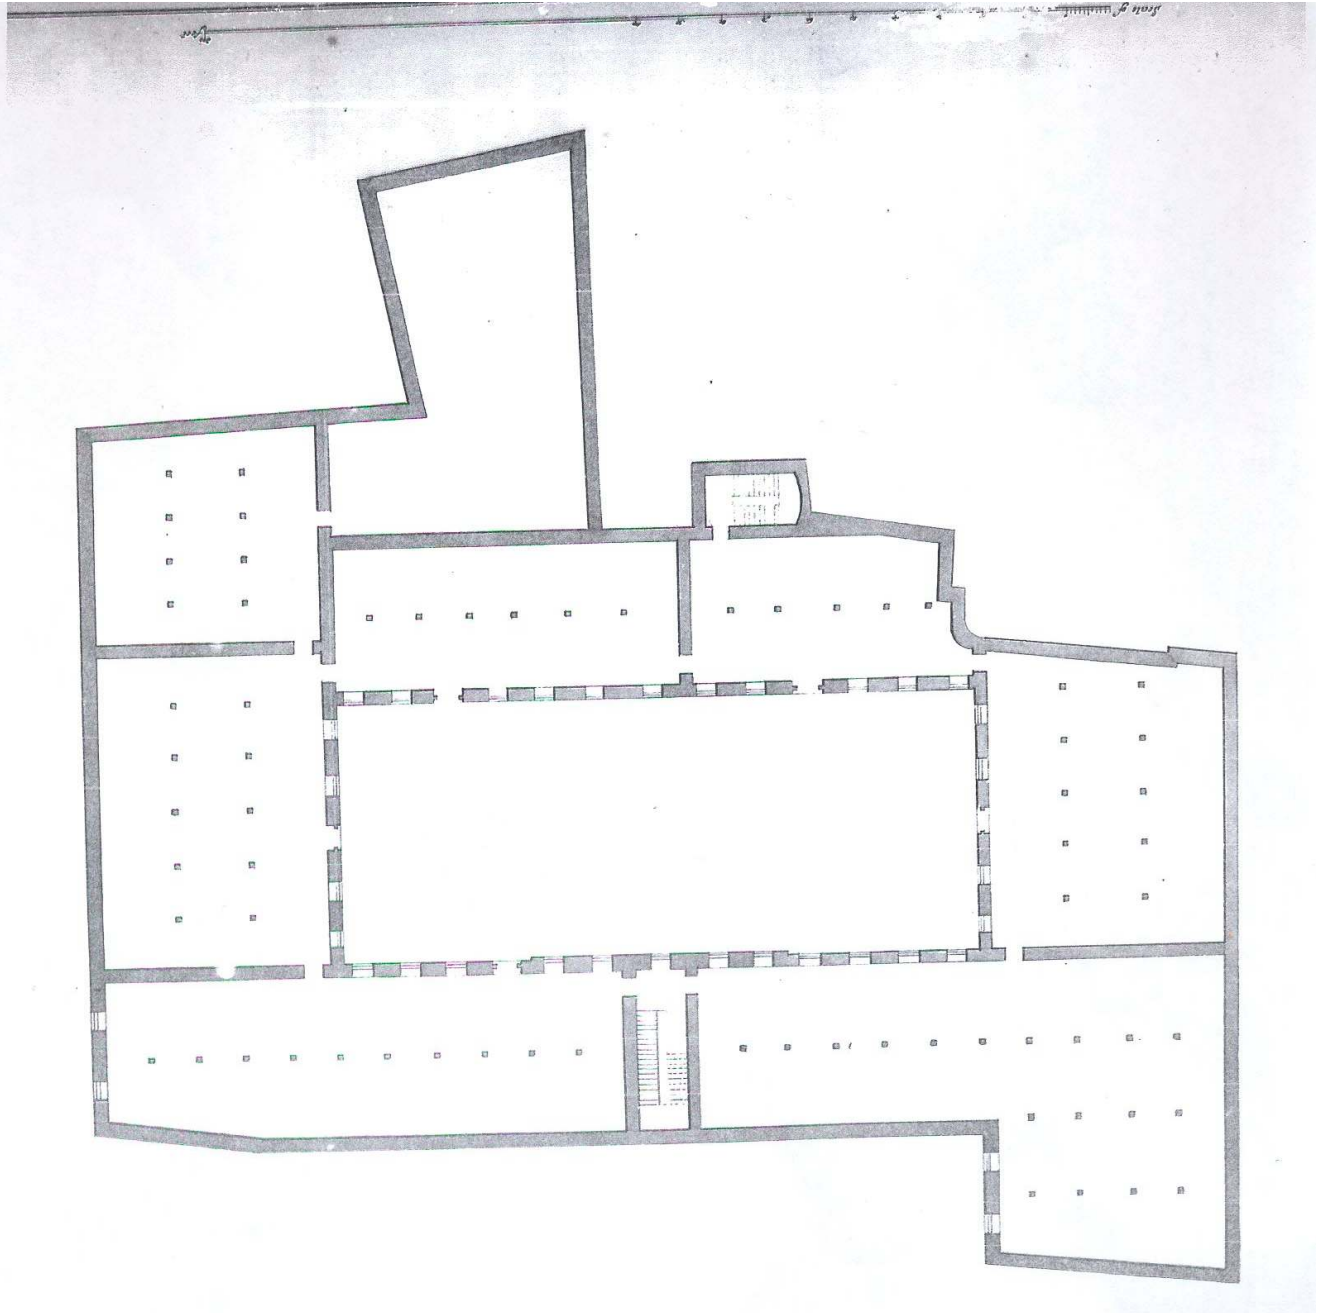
Plan of first floor of warehouse, 1805 (re-orientated North)
